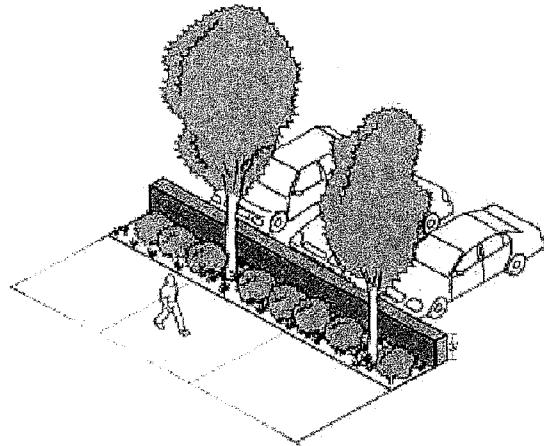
(B)(1)(a). Parking lot planting buffer with low wall.
